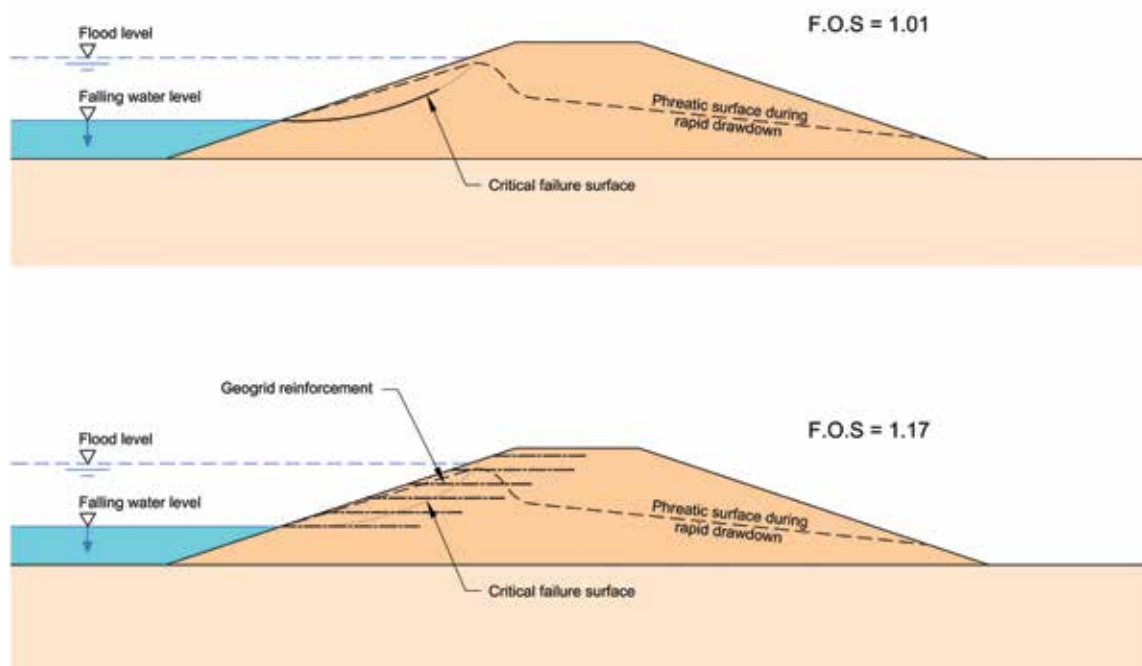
The use of geotextile reinforcement to overcome rapid draw-down (after Han *et al*, 2008)
